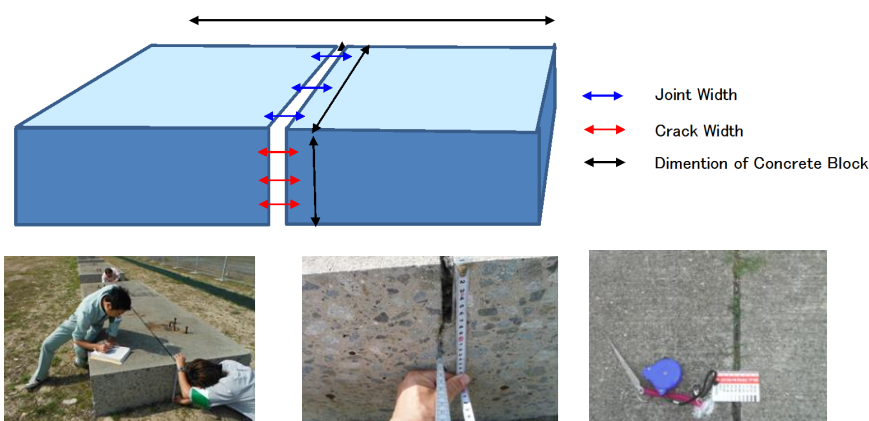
Gap terminology (Up) for pavement and measurement of joint width on concrete block (Bottom)
